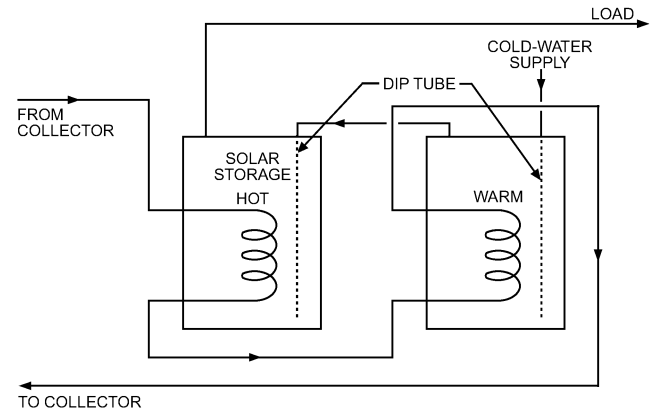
Multiple Storage Tank Arrangement with Internal Heat Exchangers
